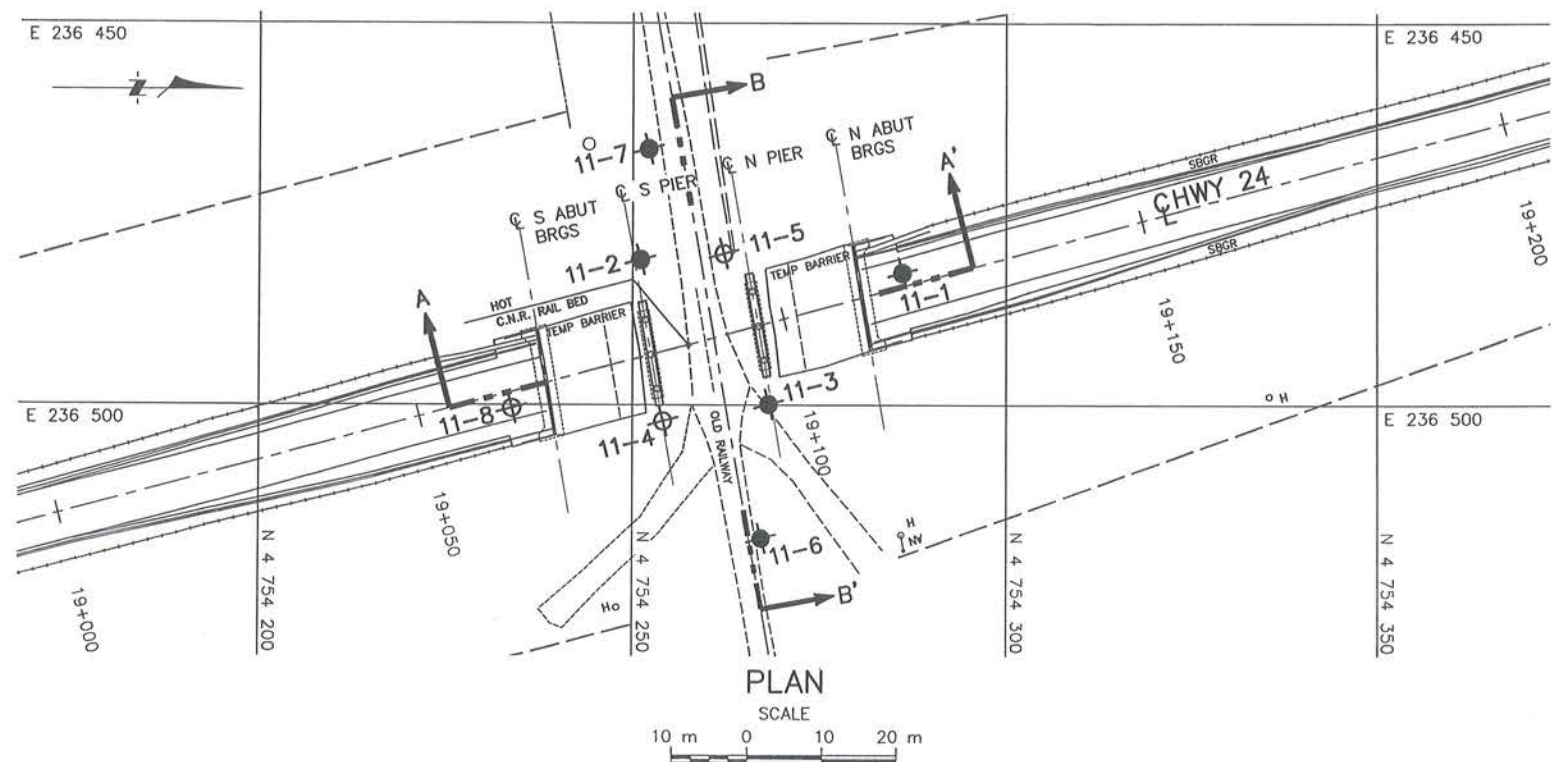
and 2 – Borehole Location Plan and Soil Strata
